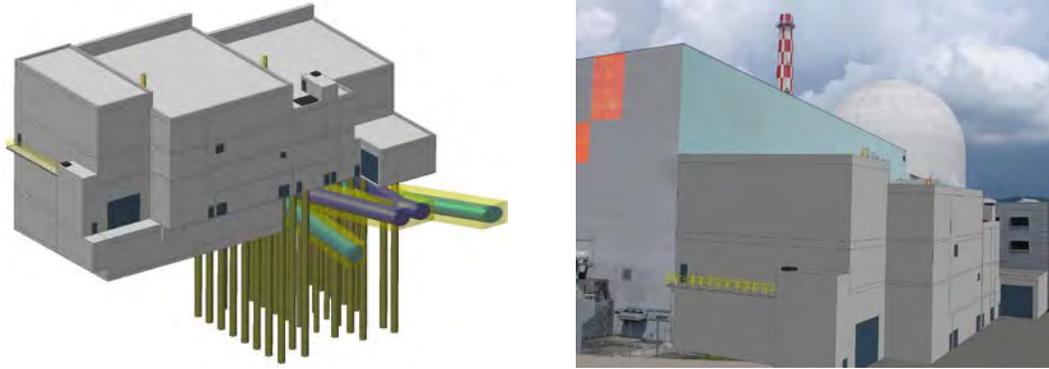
SW perspective view of the projected ZENT south and north buildings above already existing main cooling water pipelines (left) and along east façade of turbine building (right)
